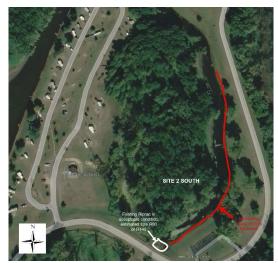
Site 2 South Bank Stabilization No-Existing Riprap
